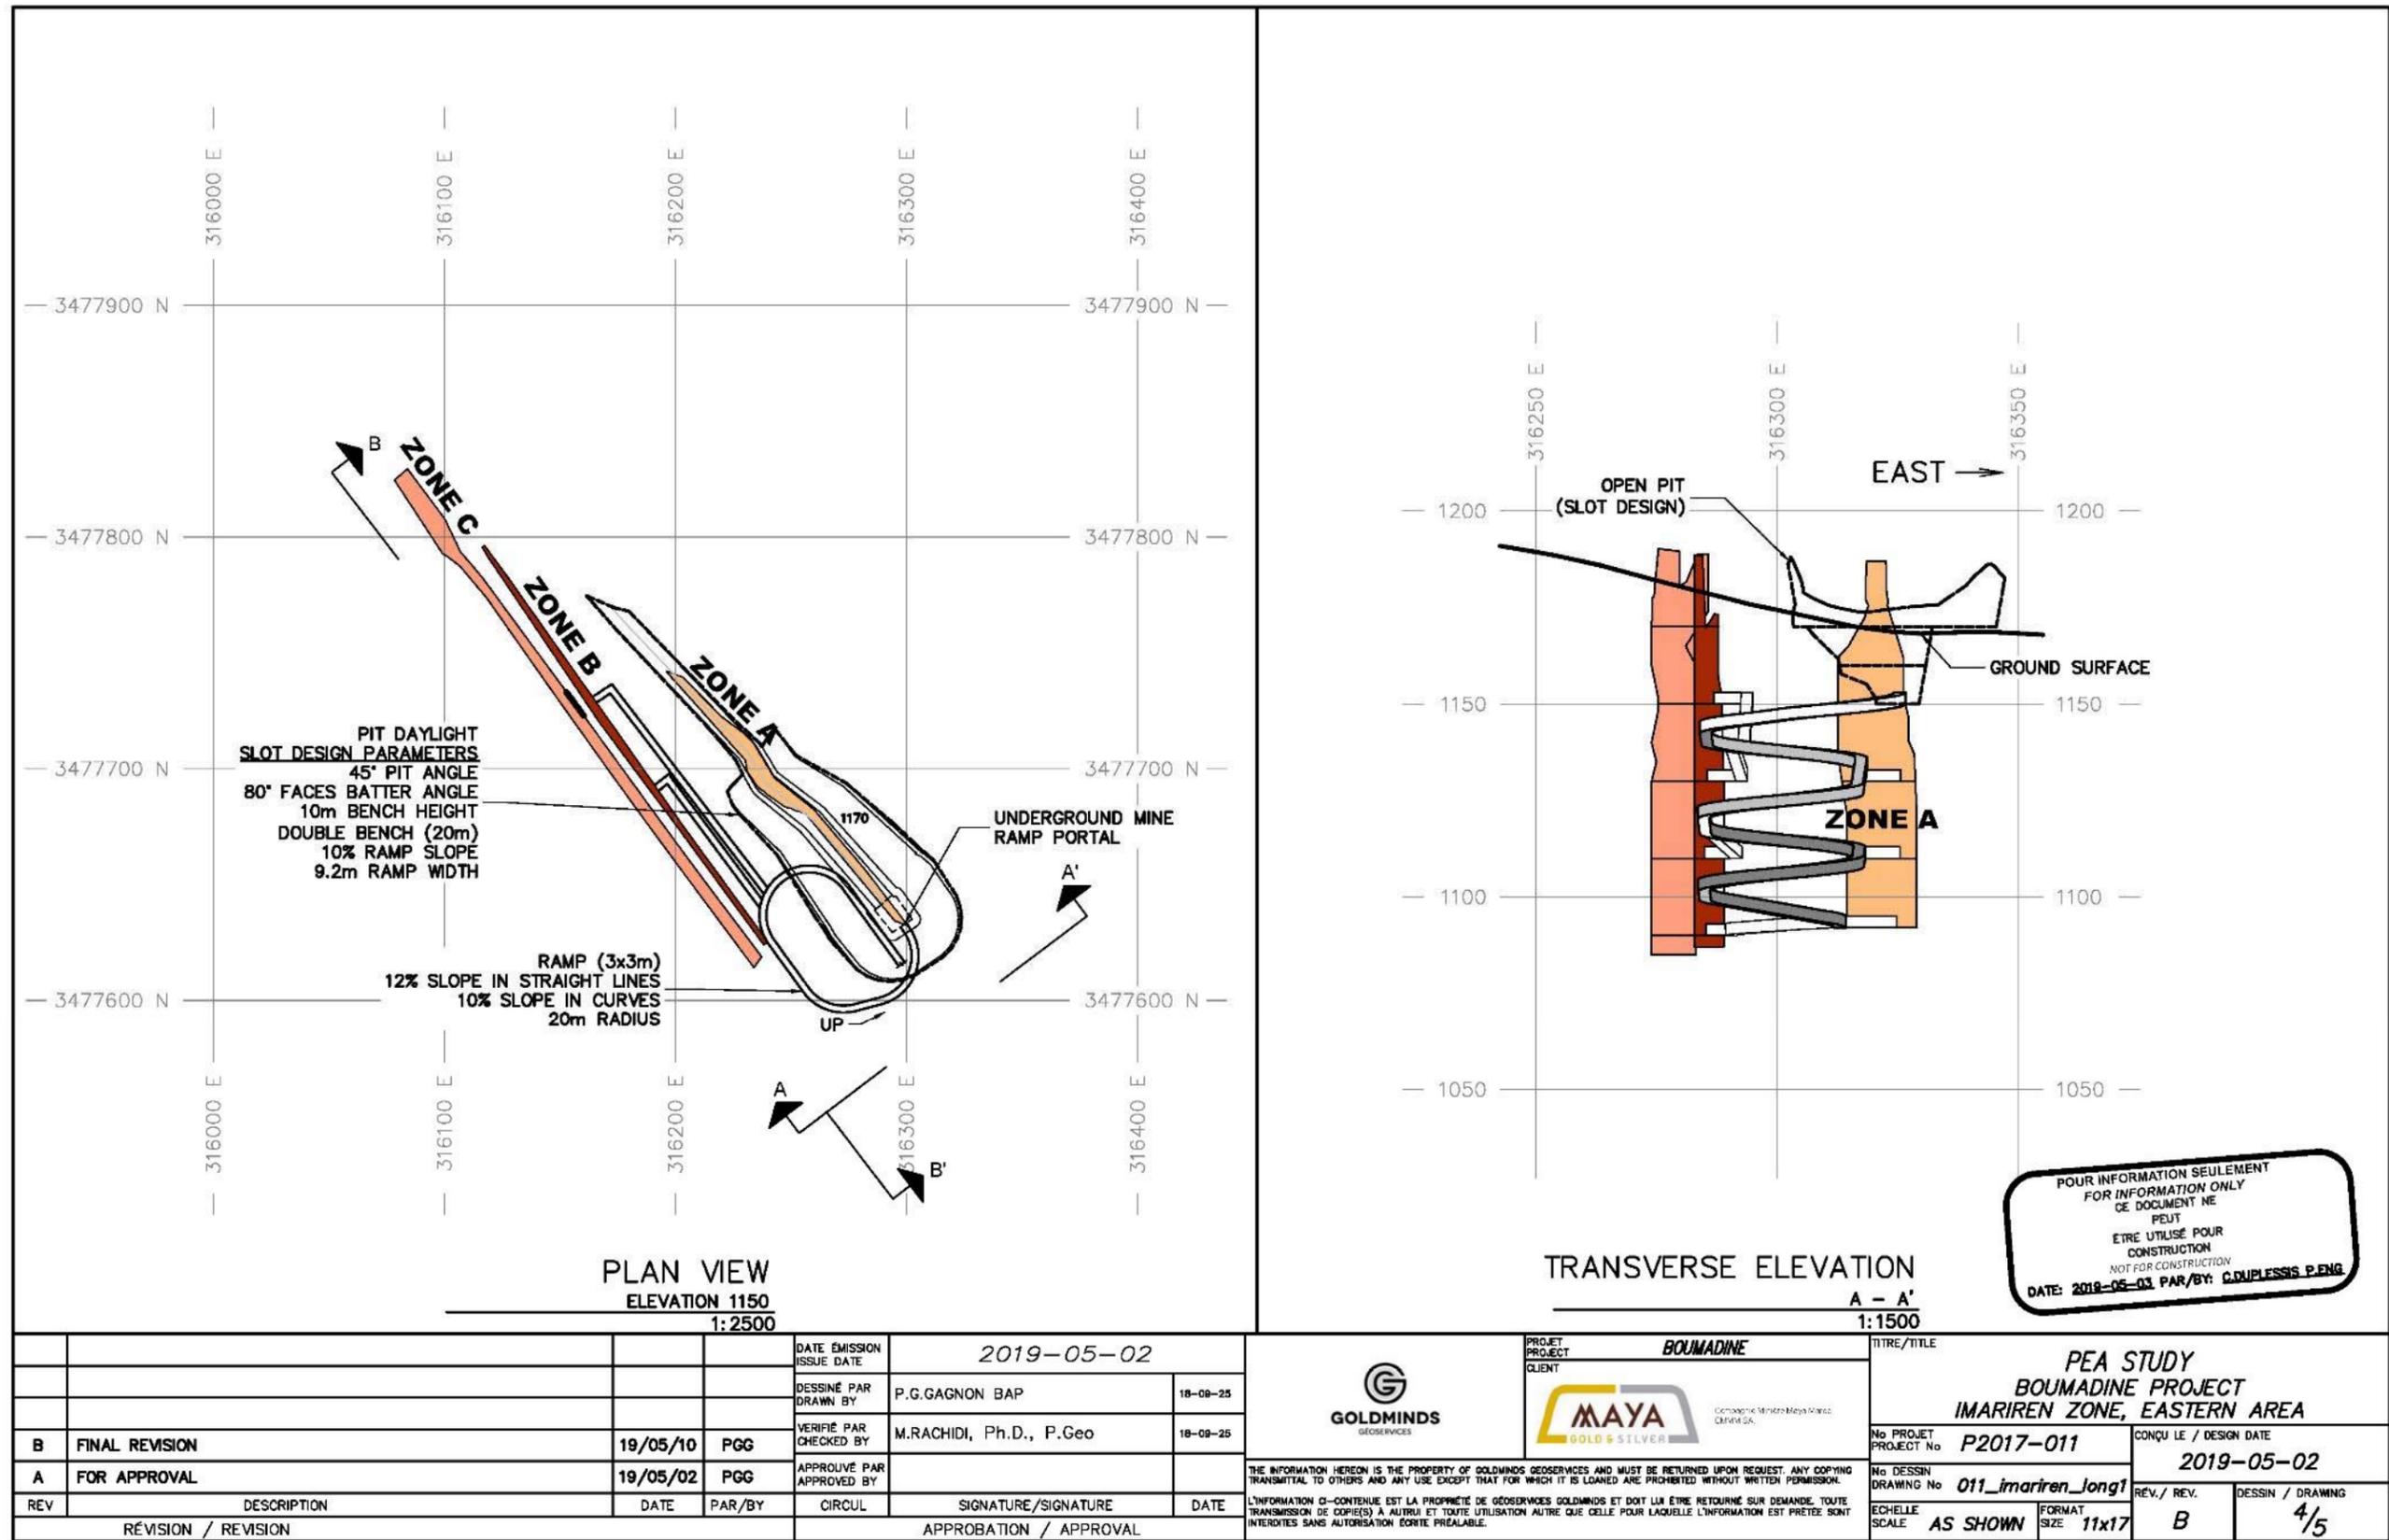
IMARIREN zone, eastern area, plan view and transverse elevation.
